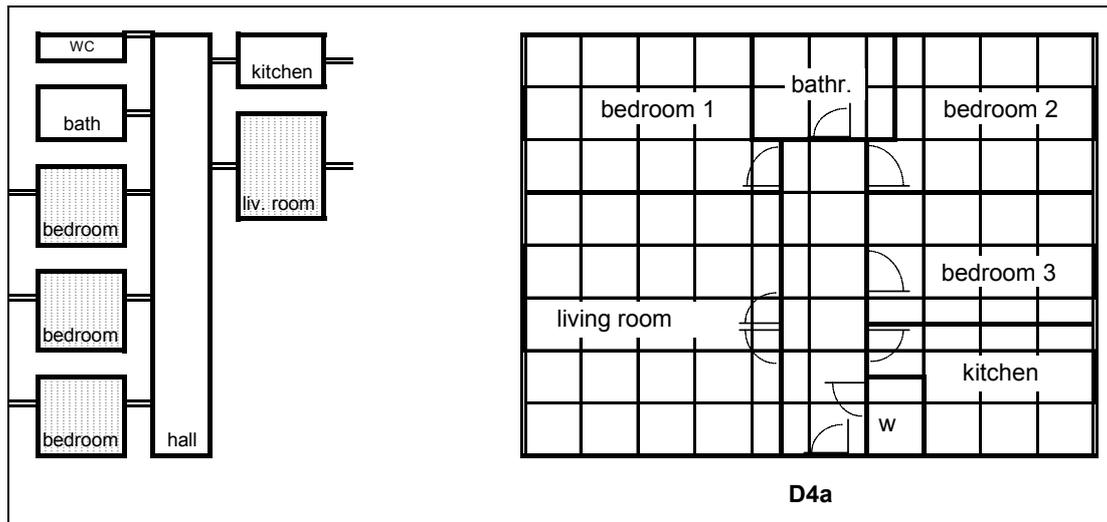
Four room apartment D4a (ground floor and top floor)
